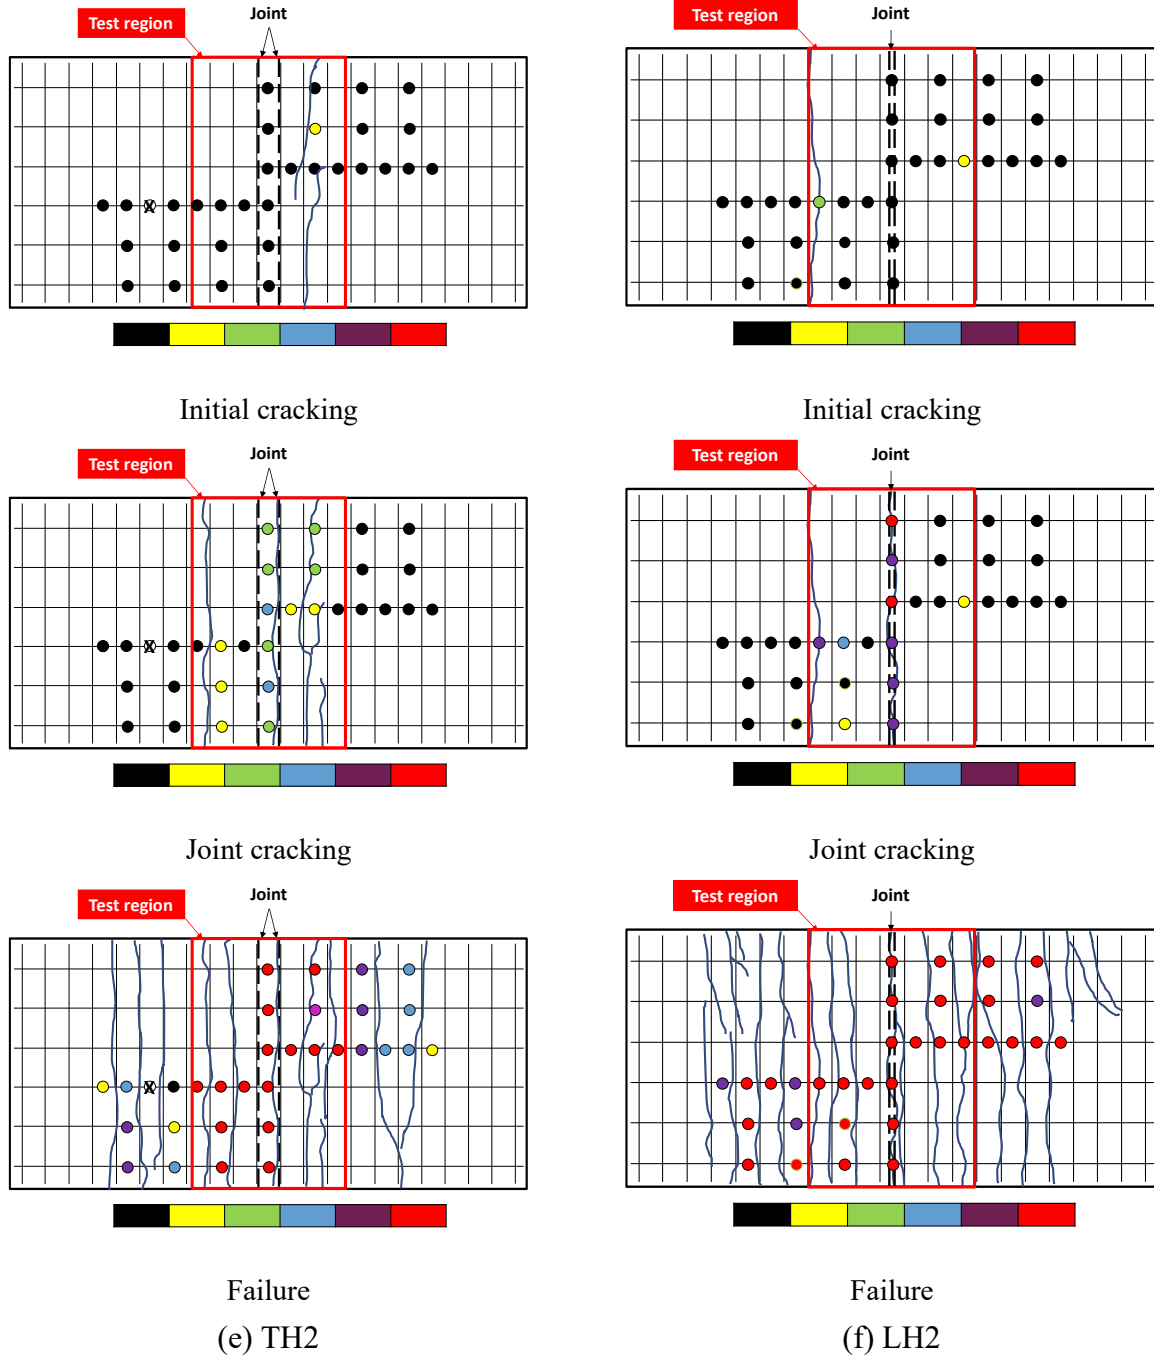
Rebar stress distribution with crack patterns of deck specimens
